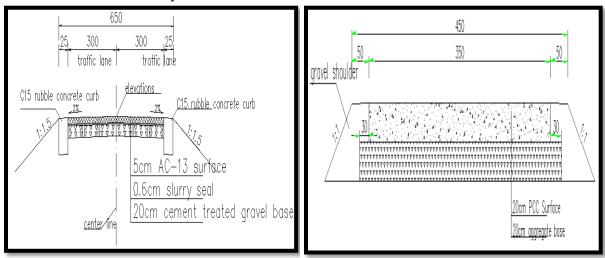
Asphalt Concrete and Cement Concrete Road Design
